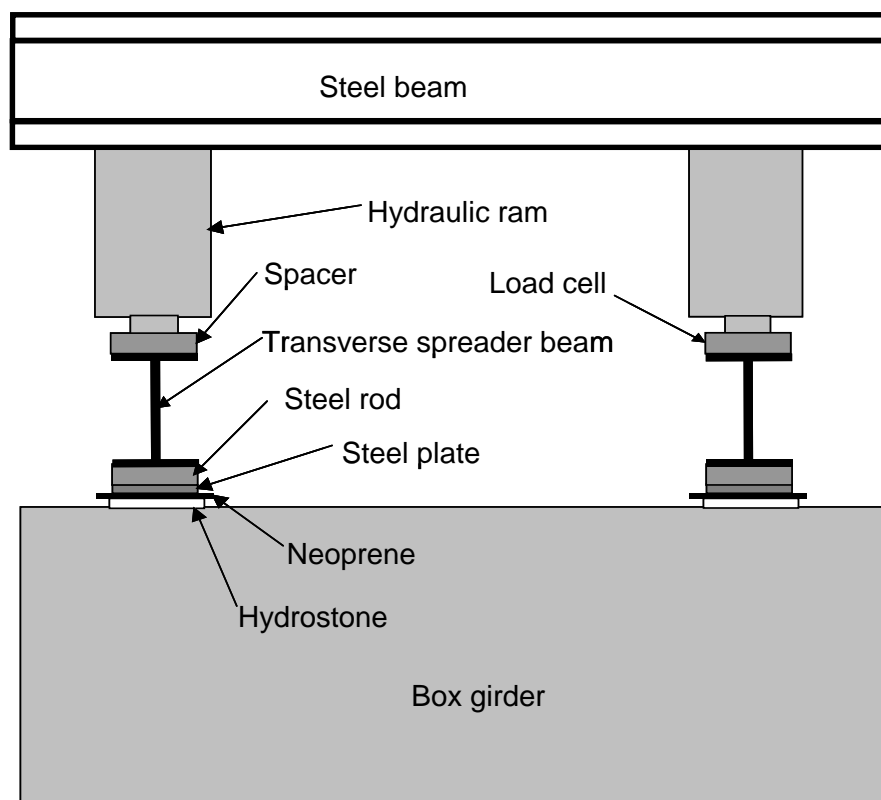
Detail of loading setup for shear-dominated fatigue specimens (elevation)
